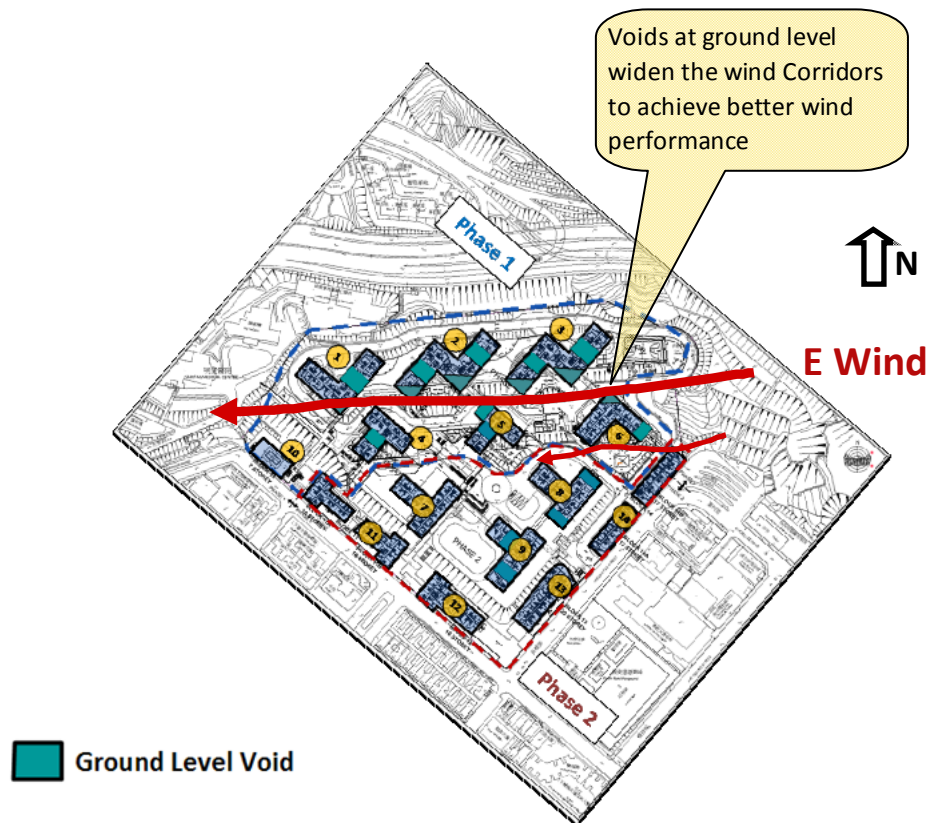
Ground floor ventilation corridor favors E wind to penetrate the site
